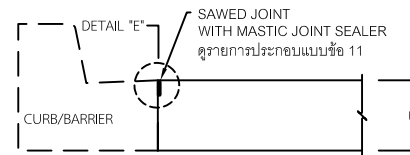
DETAIL OF JOINT BETWEEN NEW AND EXISTING CONCRETE PAVEMENT (LONGITUDINAL JOINT)
